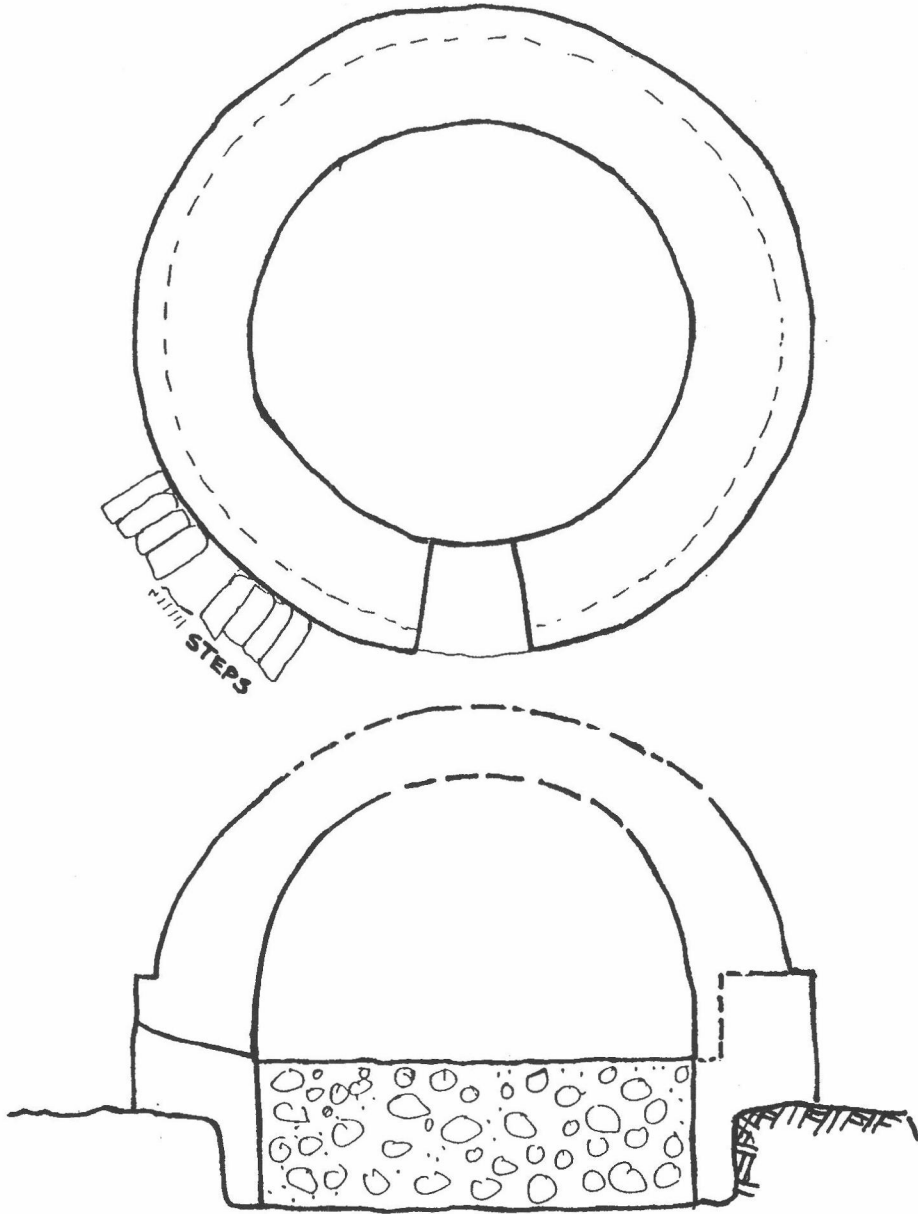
The Masada kiln – schematic plan and section (after Sasson 1990: 60).
